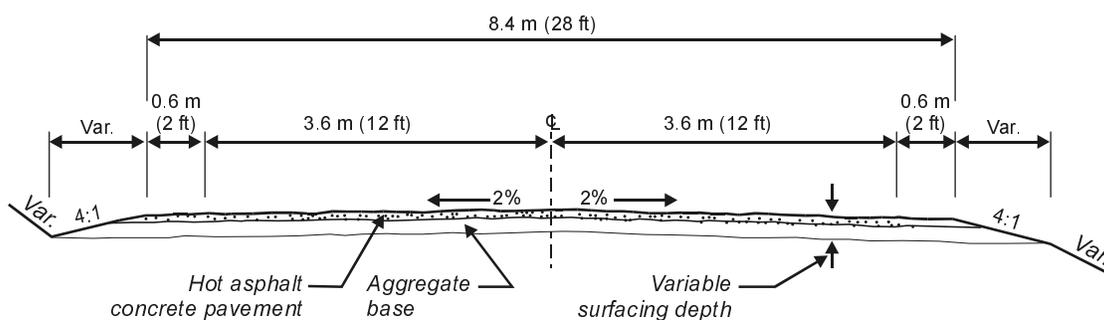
Typical cross section, MP 0.0 to MP 5.3.
